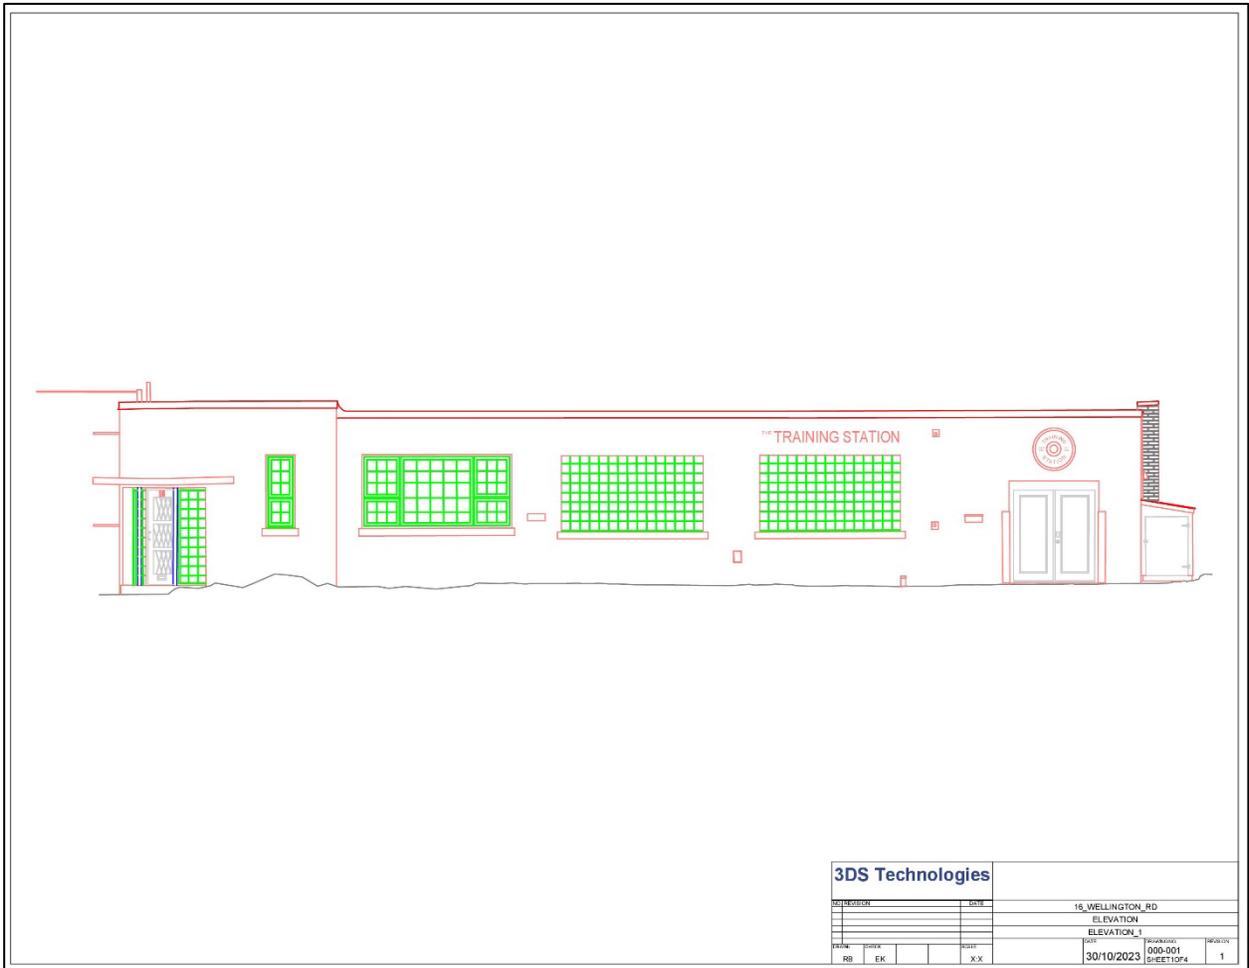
South elevation of the building at 16 Wellington Road (3DS Technologies, dated October 30, 2023).
